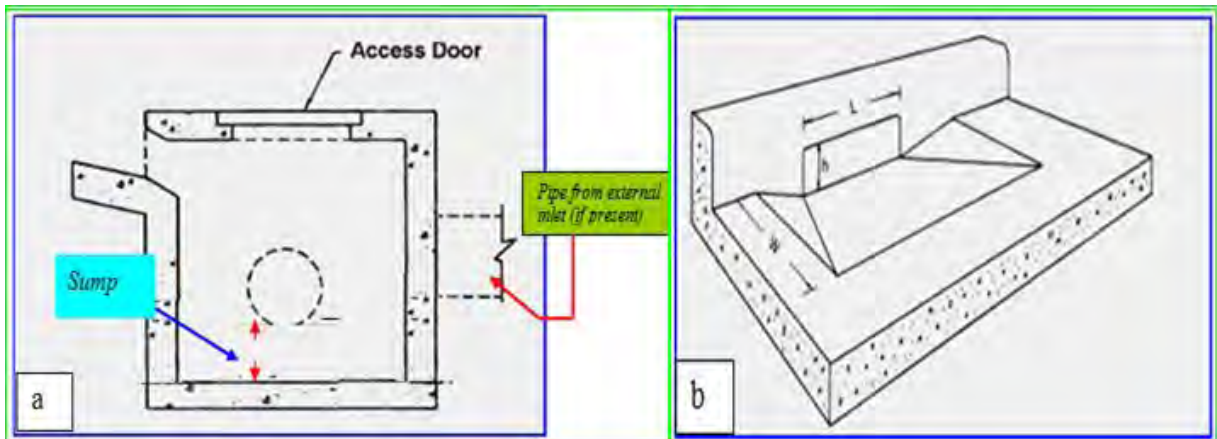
(a) Curb-opening drop inlet with access door, (b) Curb-opening inlet over view
